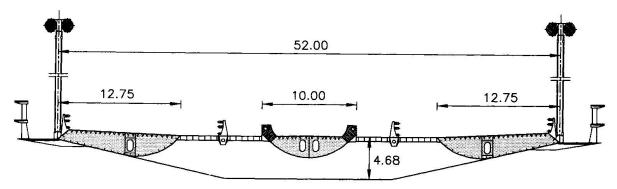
Cross section of the Messina Strait Bridge as developed by Stretto di Messina SpA
